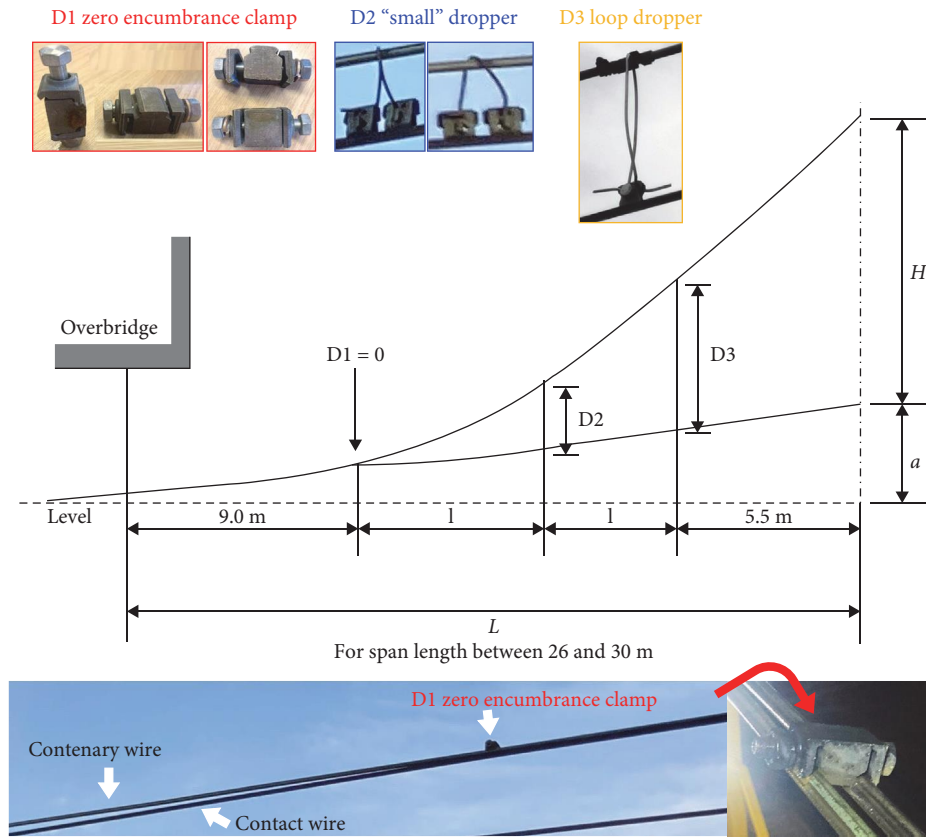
Bridge approaching droppers—D1, D2, and D3 in a bridge approaching span.
